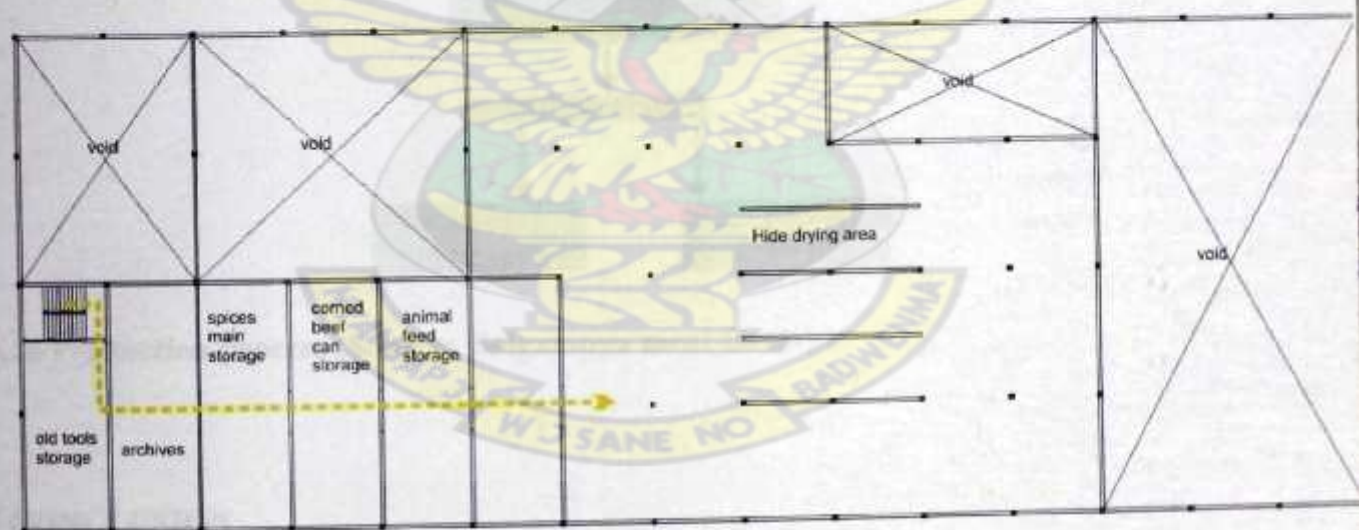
First floor plan (Source: Bolgatanga meat factory) – (Existing)
